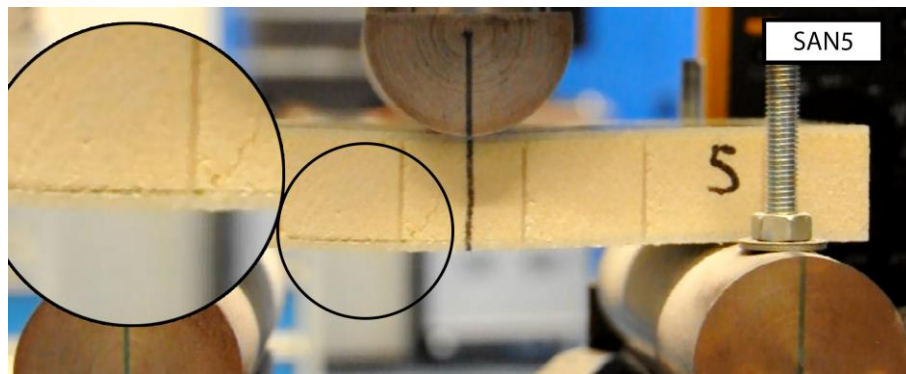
Debonding failure mechanism in the SAN5 specimen.
